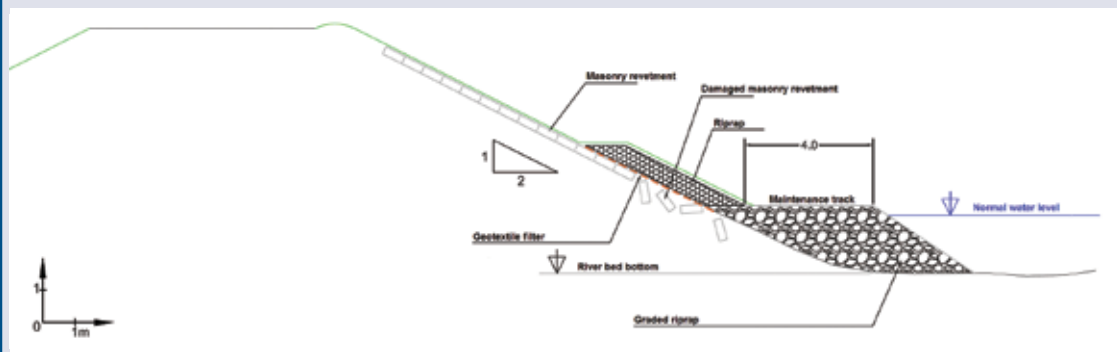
Levee cross-section with rip-rap reinforcement (courtesy to Nicolas Auger)
